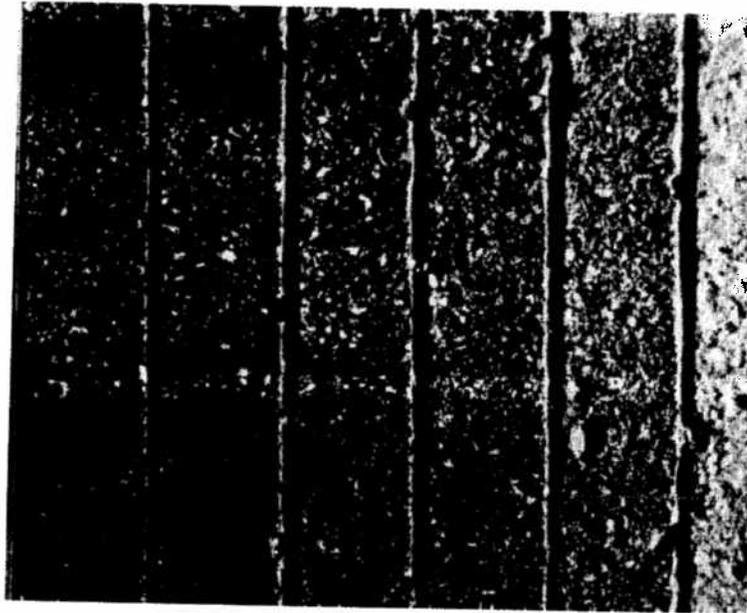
SAWED GROOVES IN HMA PAVEMENT
